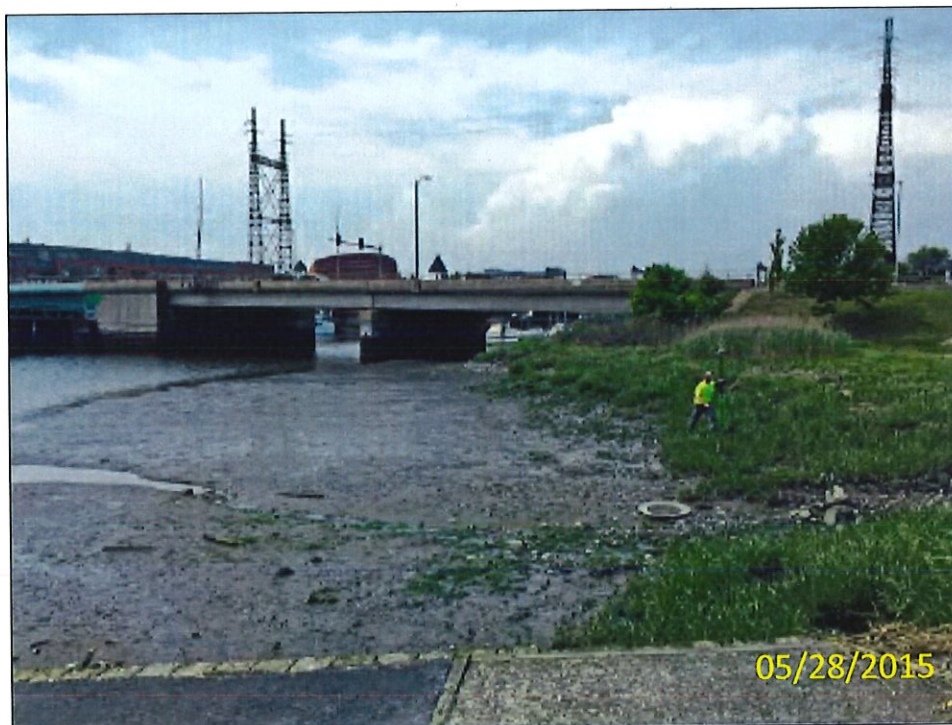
View of wetlands in Southeast Quadrant from boat ramp (looking north).
